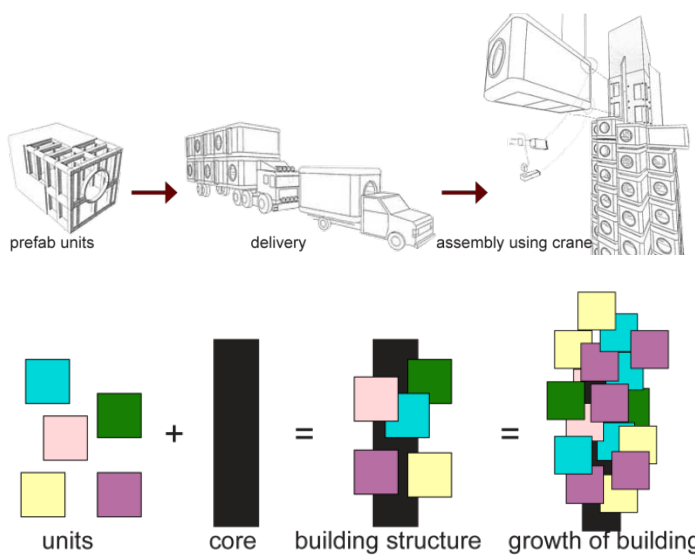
8 Nakagin Capsule Tower assembly units and diagram
